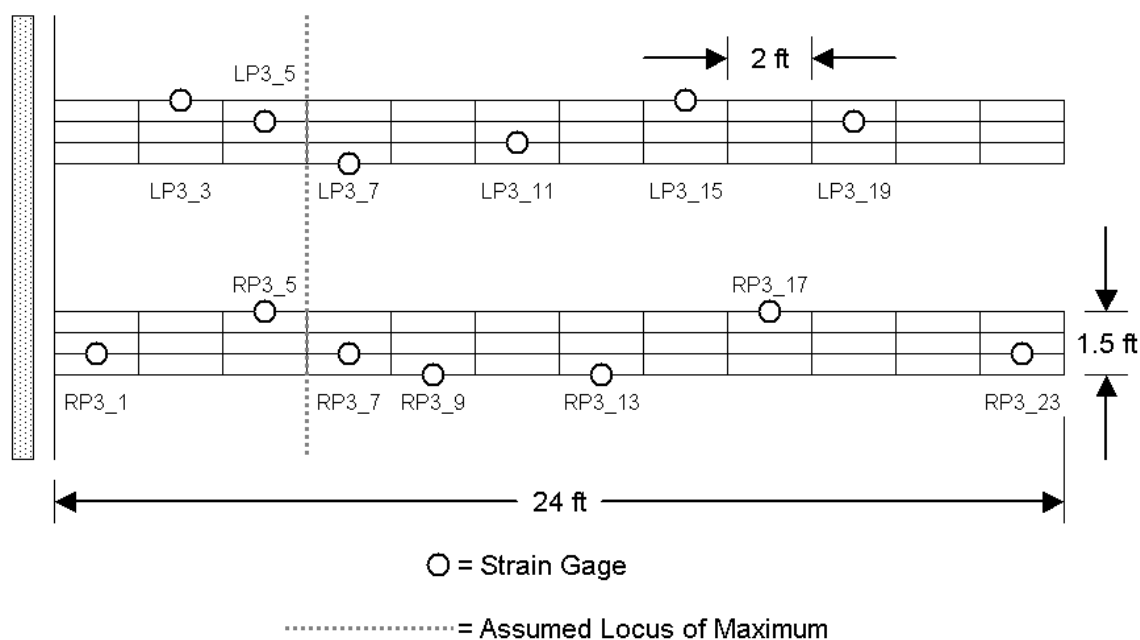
Plan view of instrumented primary bar mat PL3 at level 3 located in the primary reinforced only section.
